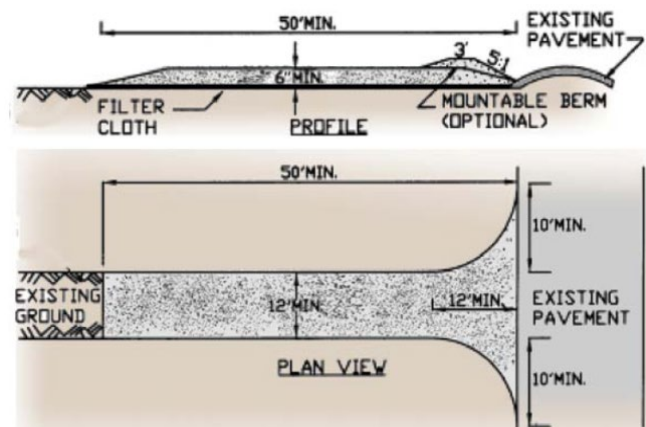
Standard detail and profile of stabilized construction entrance.
